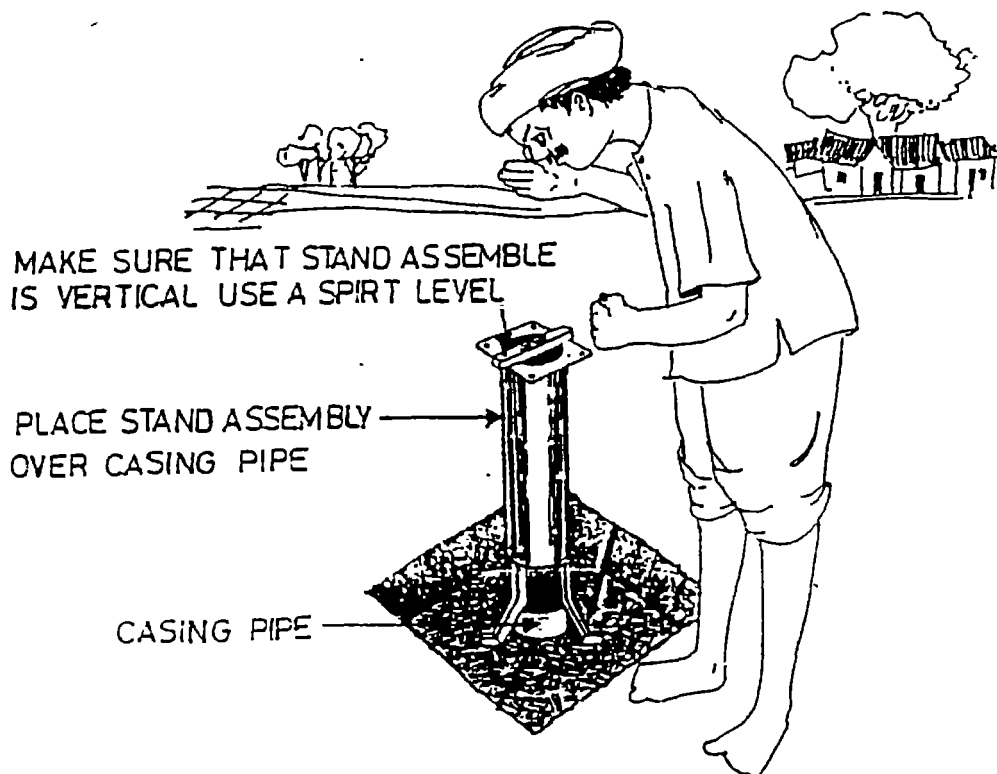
LEVELING STAND ASSEMBLY FLANGE
